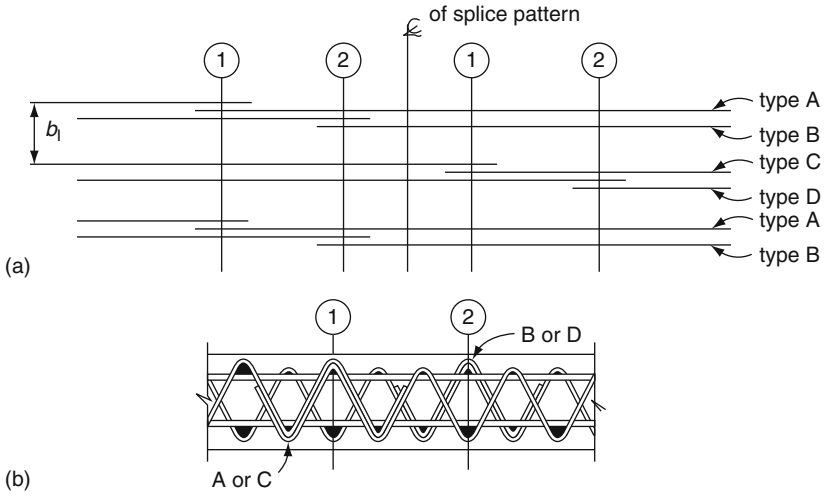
Typical details for splicing of lacing bars: (a) splice pattern; (b) lacing splice
